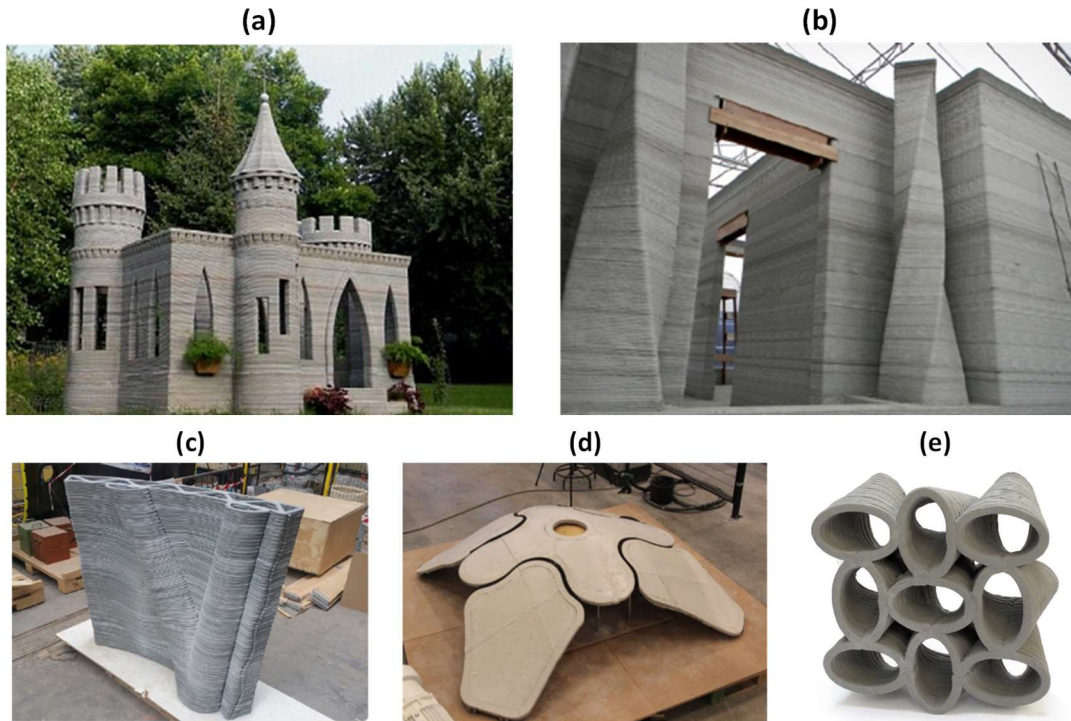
3D printed (a and b) in situ castle and wall and columns [85,87], and (c-e) vertical and horizontal walls and panels [85,90]. Note that these are made using regular concrete and not geopolymers, but are shown here for demonstration of 3D printable concrete structured.
